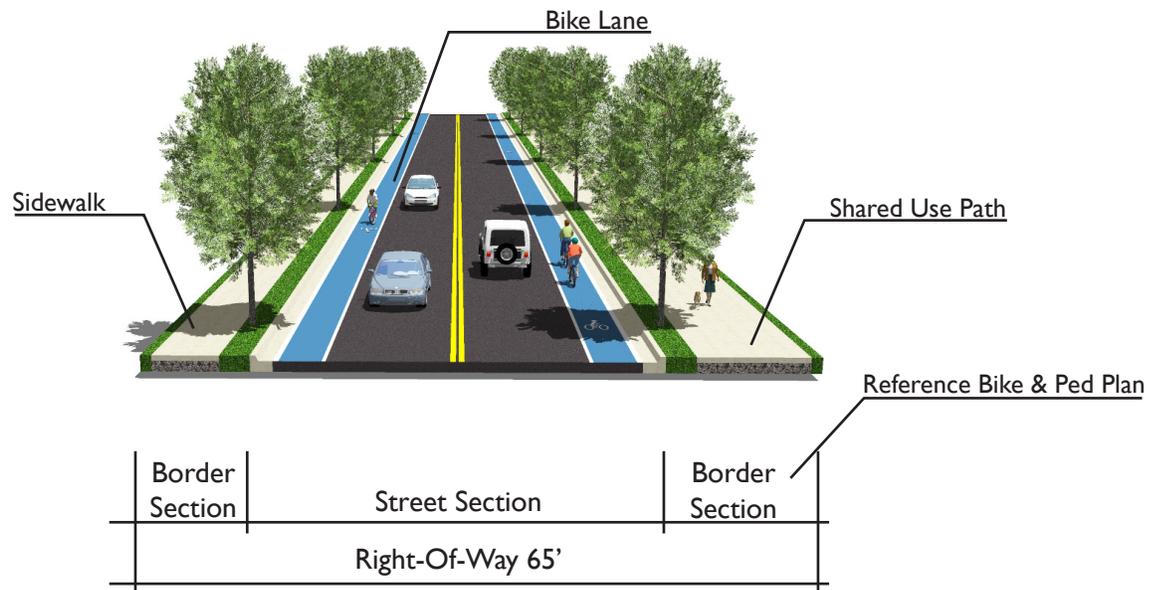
EXHIBIT W: ROAD CLASSIFICATIONS: TYPICAL CROSS SECTIONS CONT.
